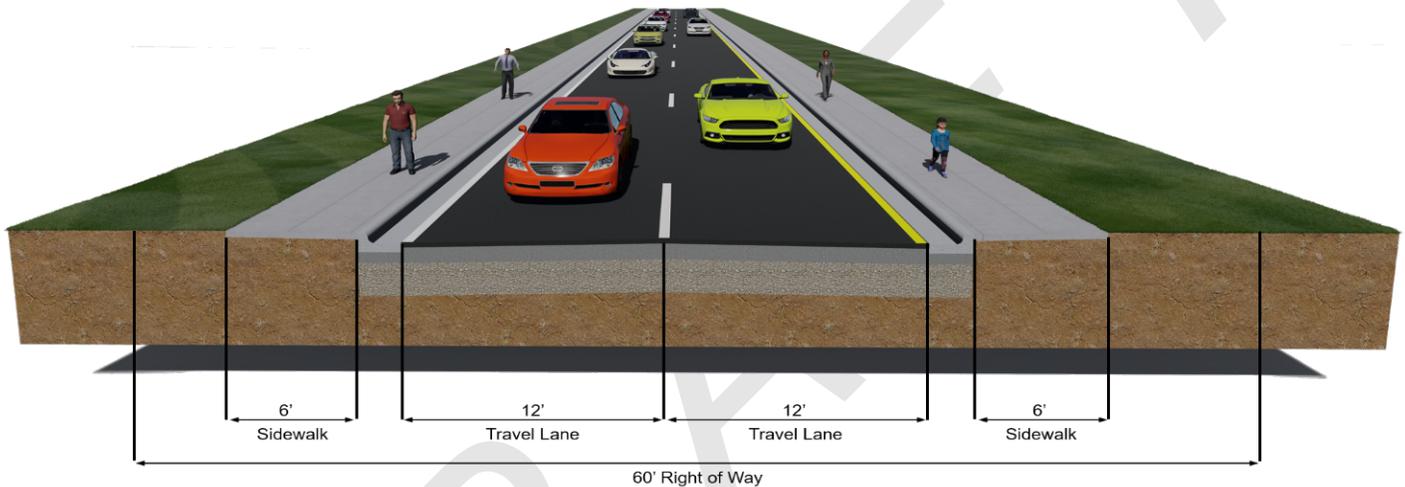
Typical Section - Rideout Ferry Quadrant Road
